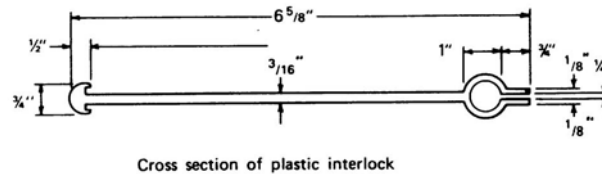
Polyethylene interlock for prestressed sheet piles (Ref 42)
